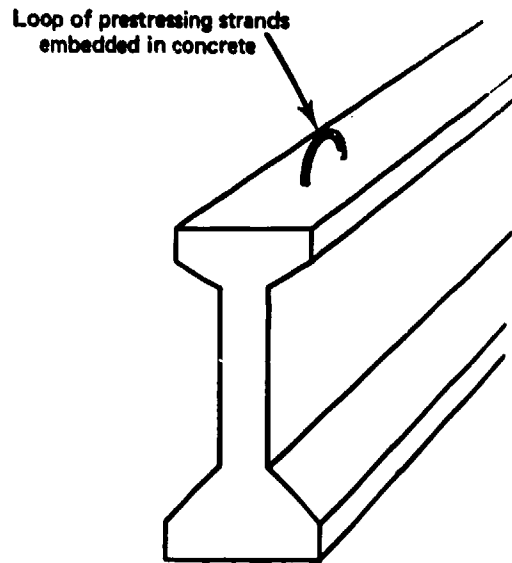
Scrap prestressing strands embedded to provide lifting eye (Courtesy of American Concrete Institute)
